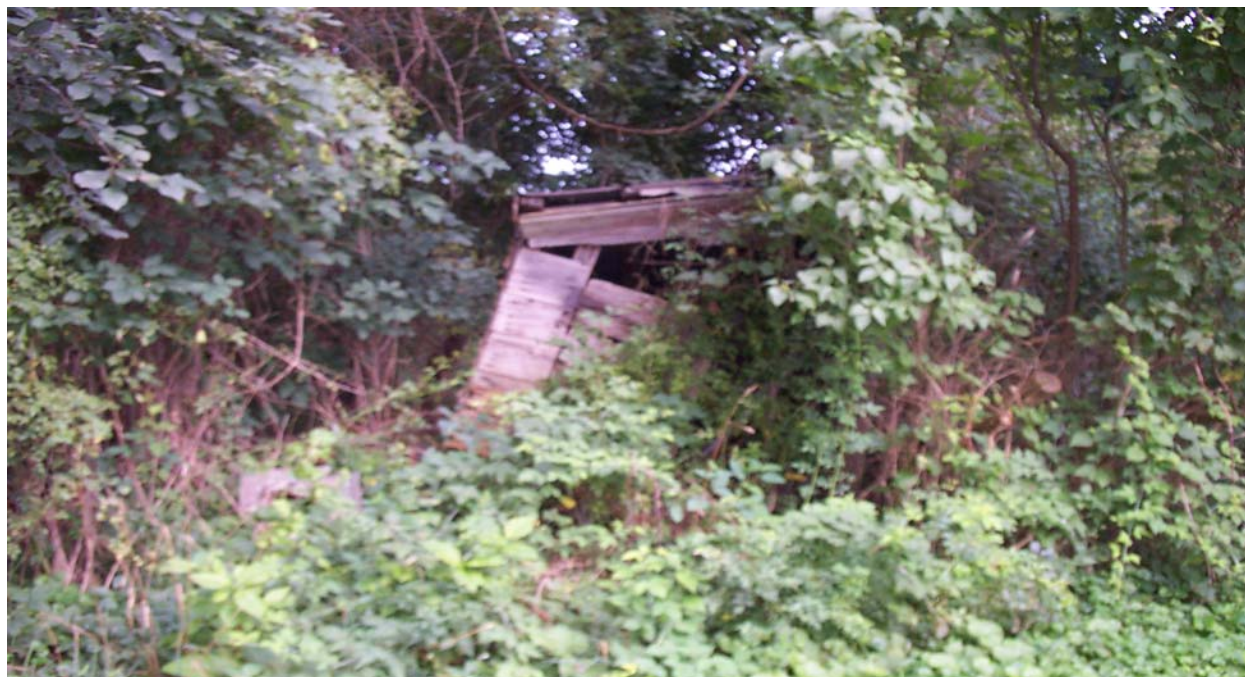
Existing Barn #1 – Right Rear View
